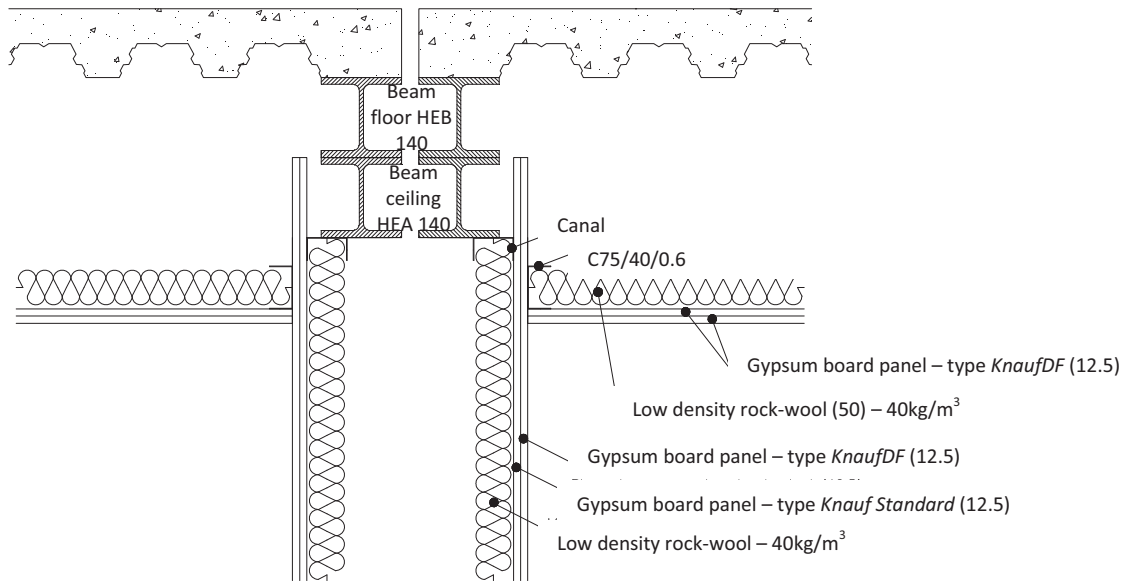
3 Construction details of the wall between modules, elevation view.
